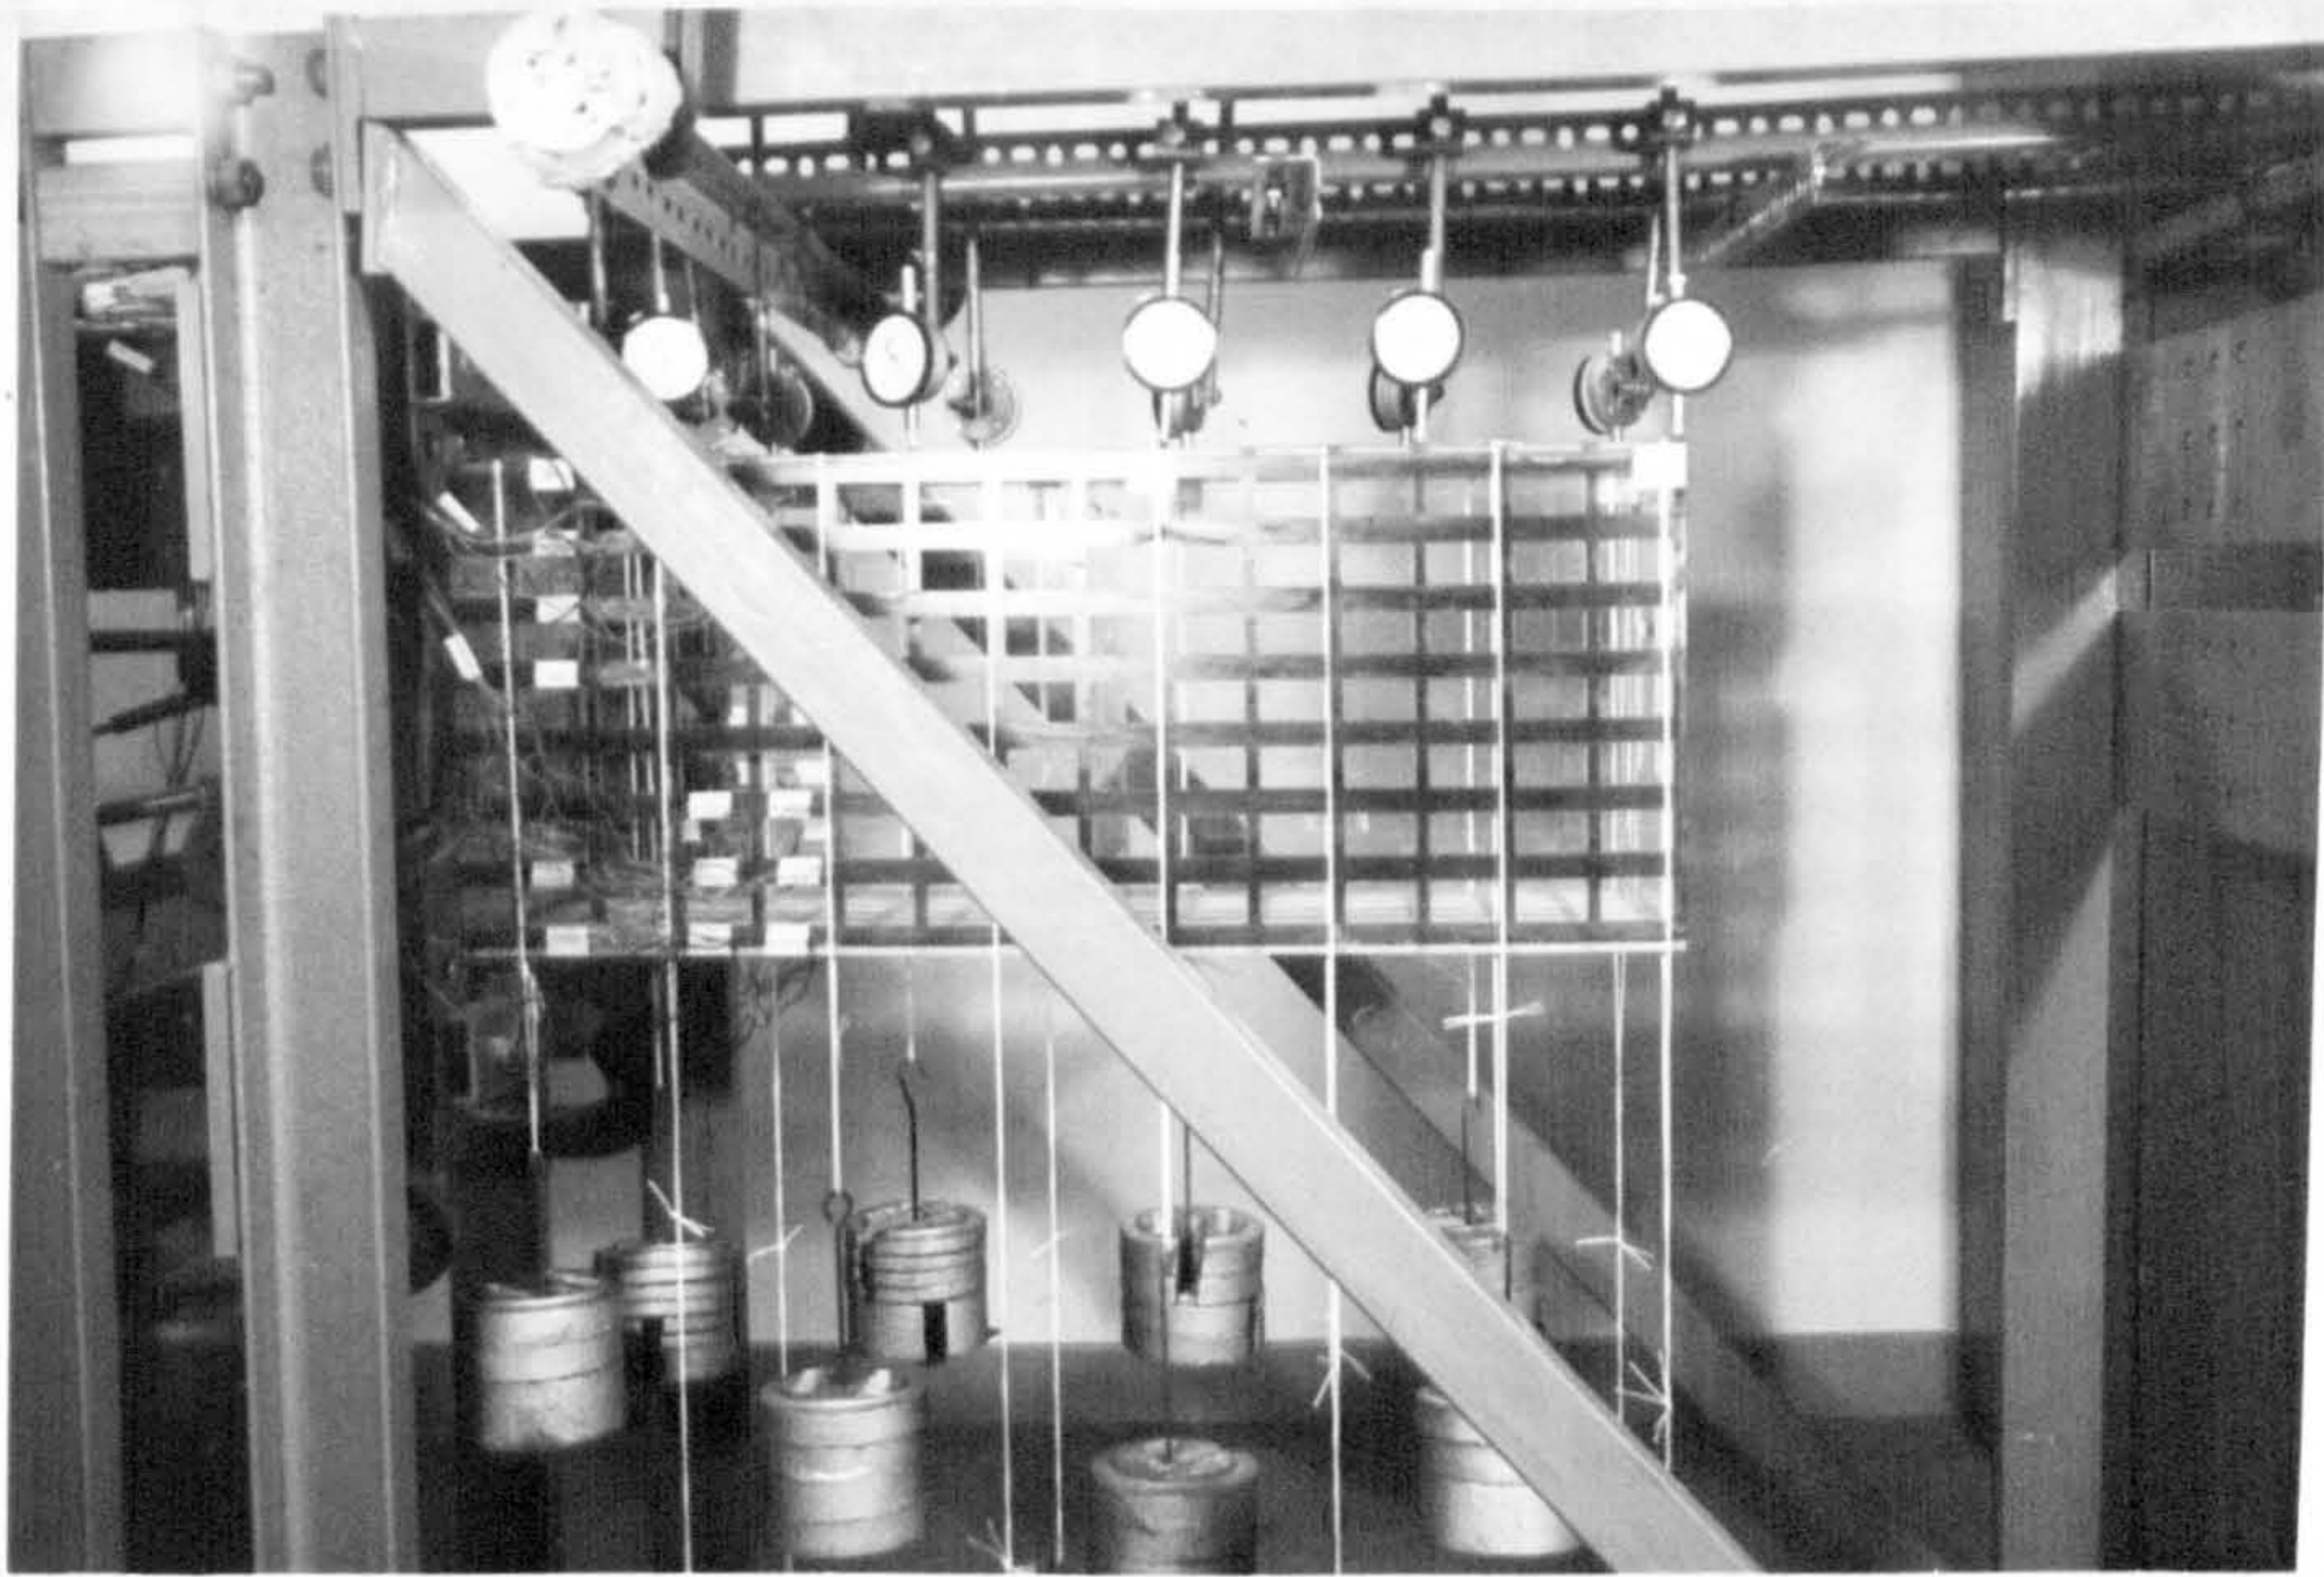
Framed-tube model showing fixing arrangement at the base
